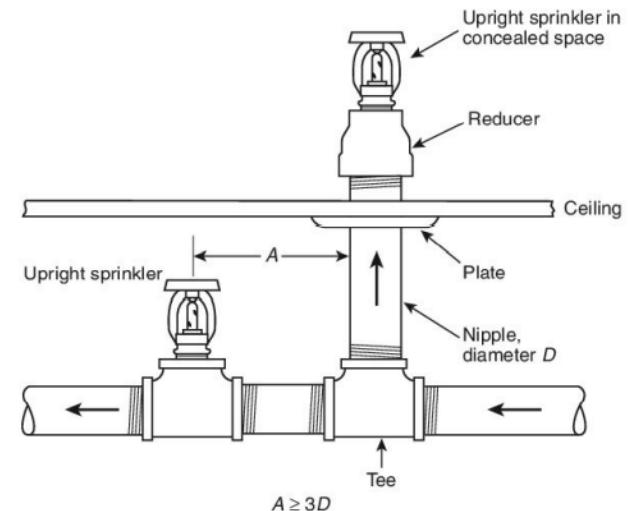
(b) Sprinkler on Riser Nipple from Branch Line in Lower Fire Area.
